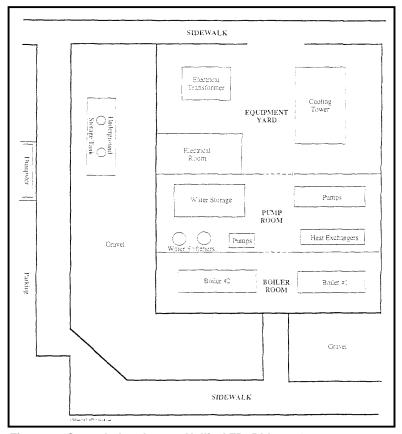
Central plant layout, Nellis AFB, Bldg. 791.
